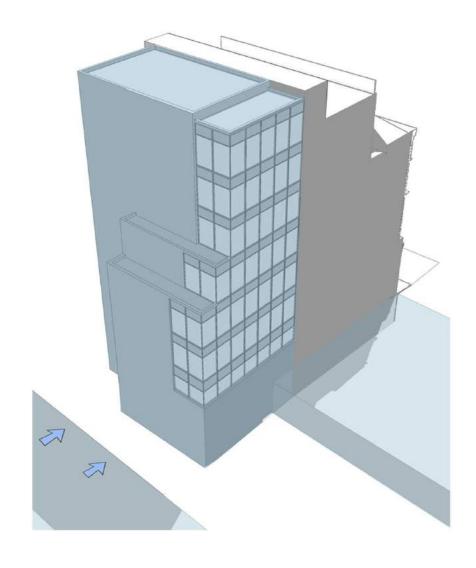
Greater distance achieved between neighbouring properties – elevation designed to have minimal impact on neighbouring buildings
